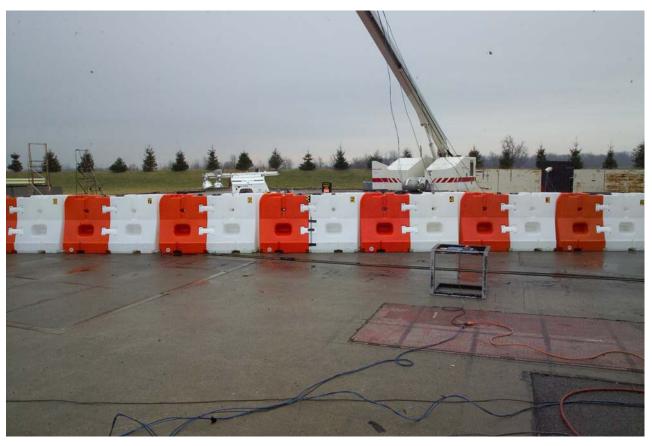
Pre-Test Channelizing Barricade Impact Side Overall View
